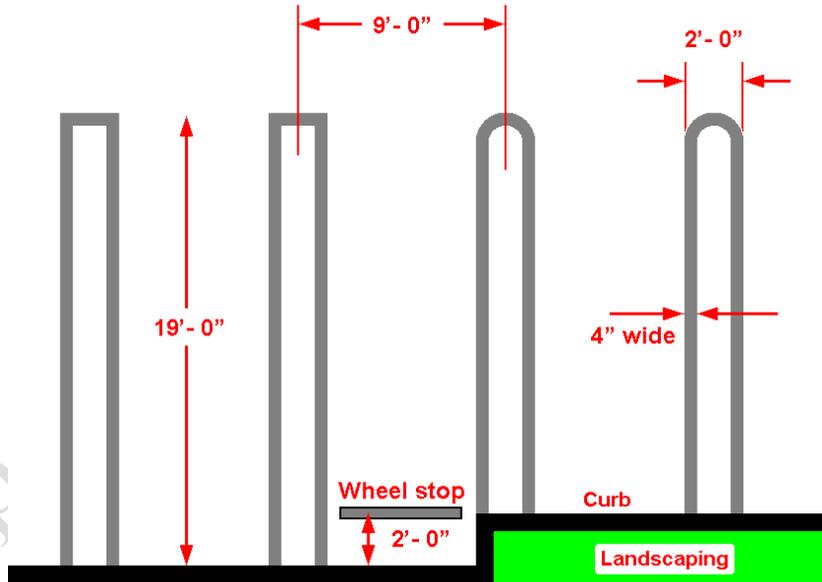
C Illustration of Parking Space Dimensions and Striping
